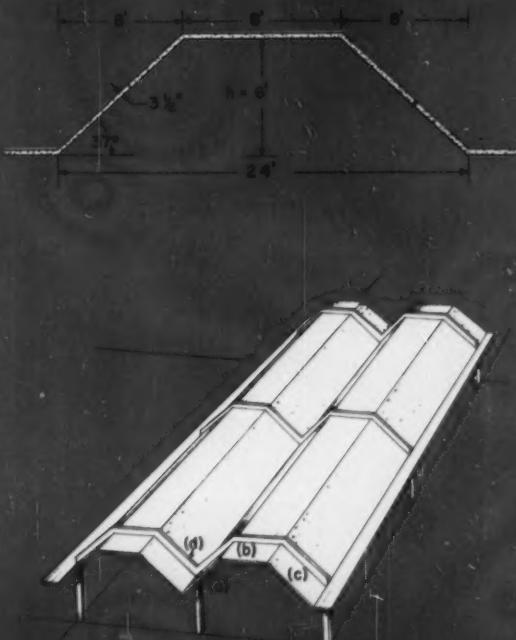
Three segment folded plate. Dimensions are for a structure with 60-ft span and 24-ft bay width.
